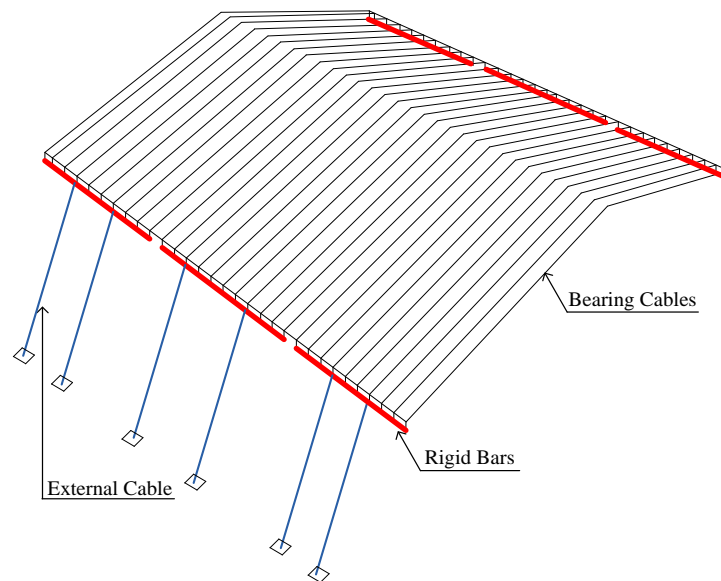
Retrofit system proposed by Jacklin and El Damatty (2014)
